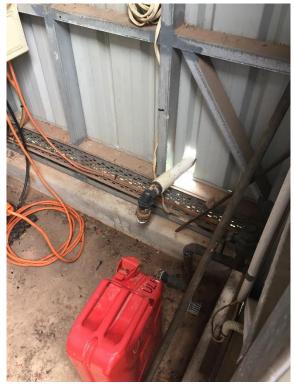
View north west of ARFFS LMU Defence training ground bunded storage area of separator.
